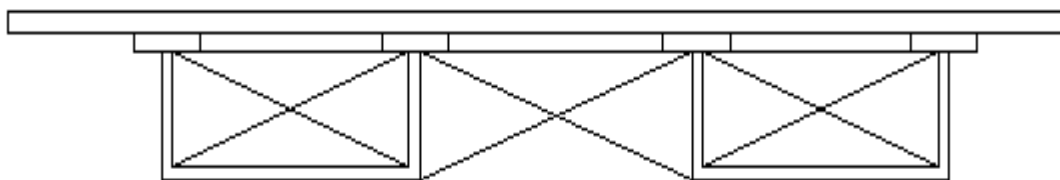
Concrete slabs over multi-steel box girder bridges
